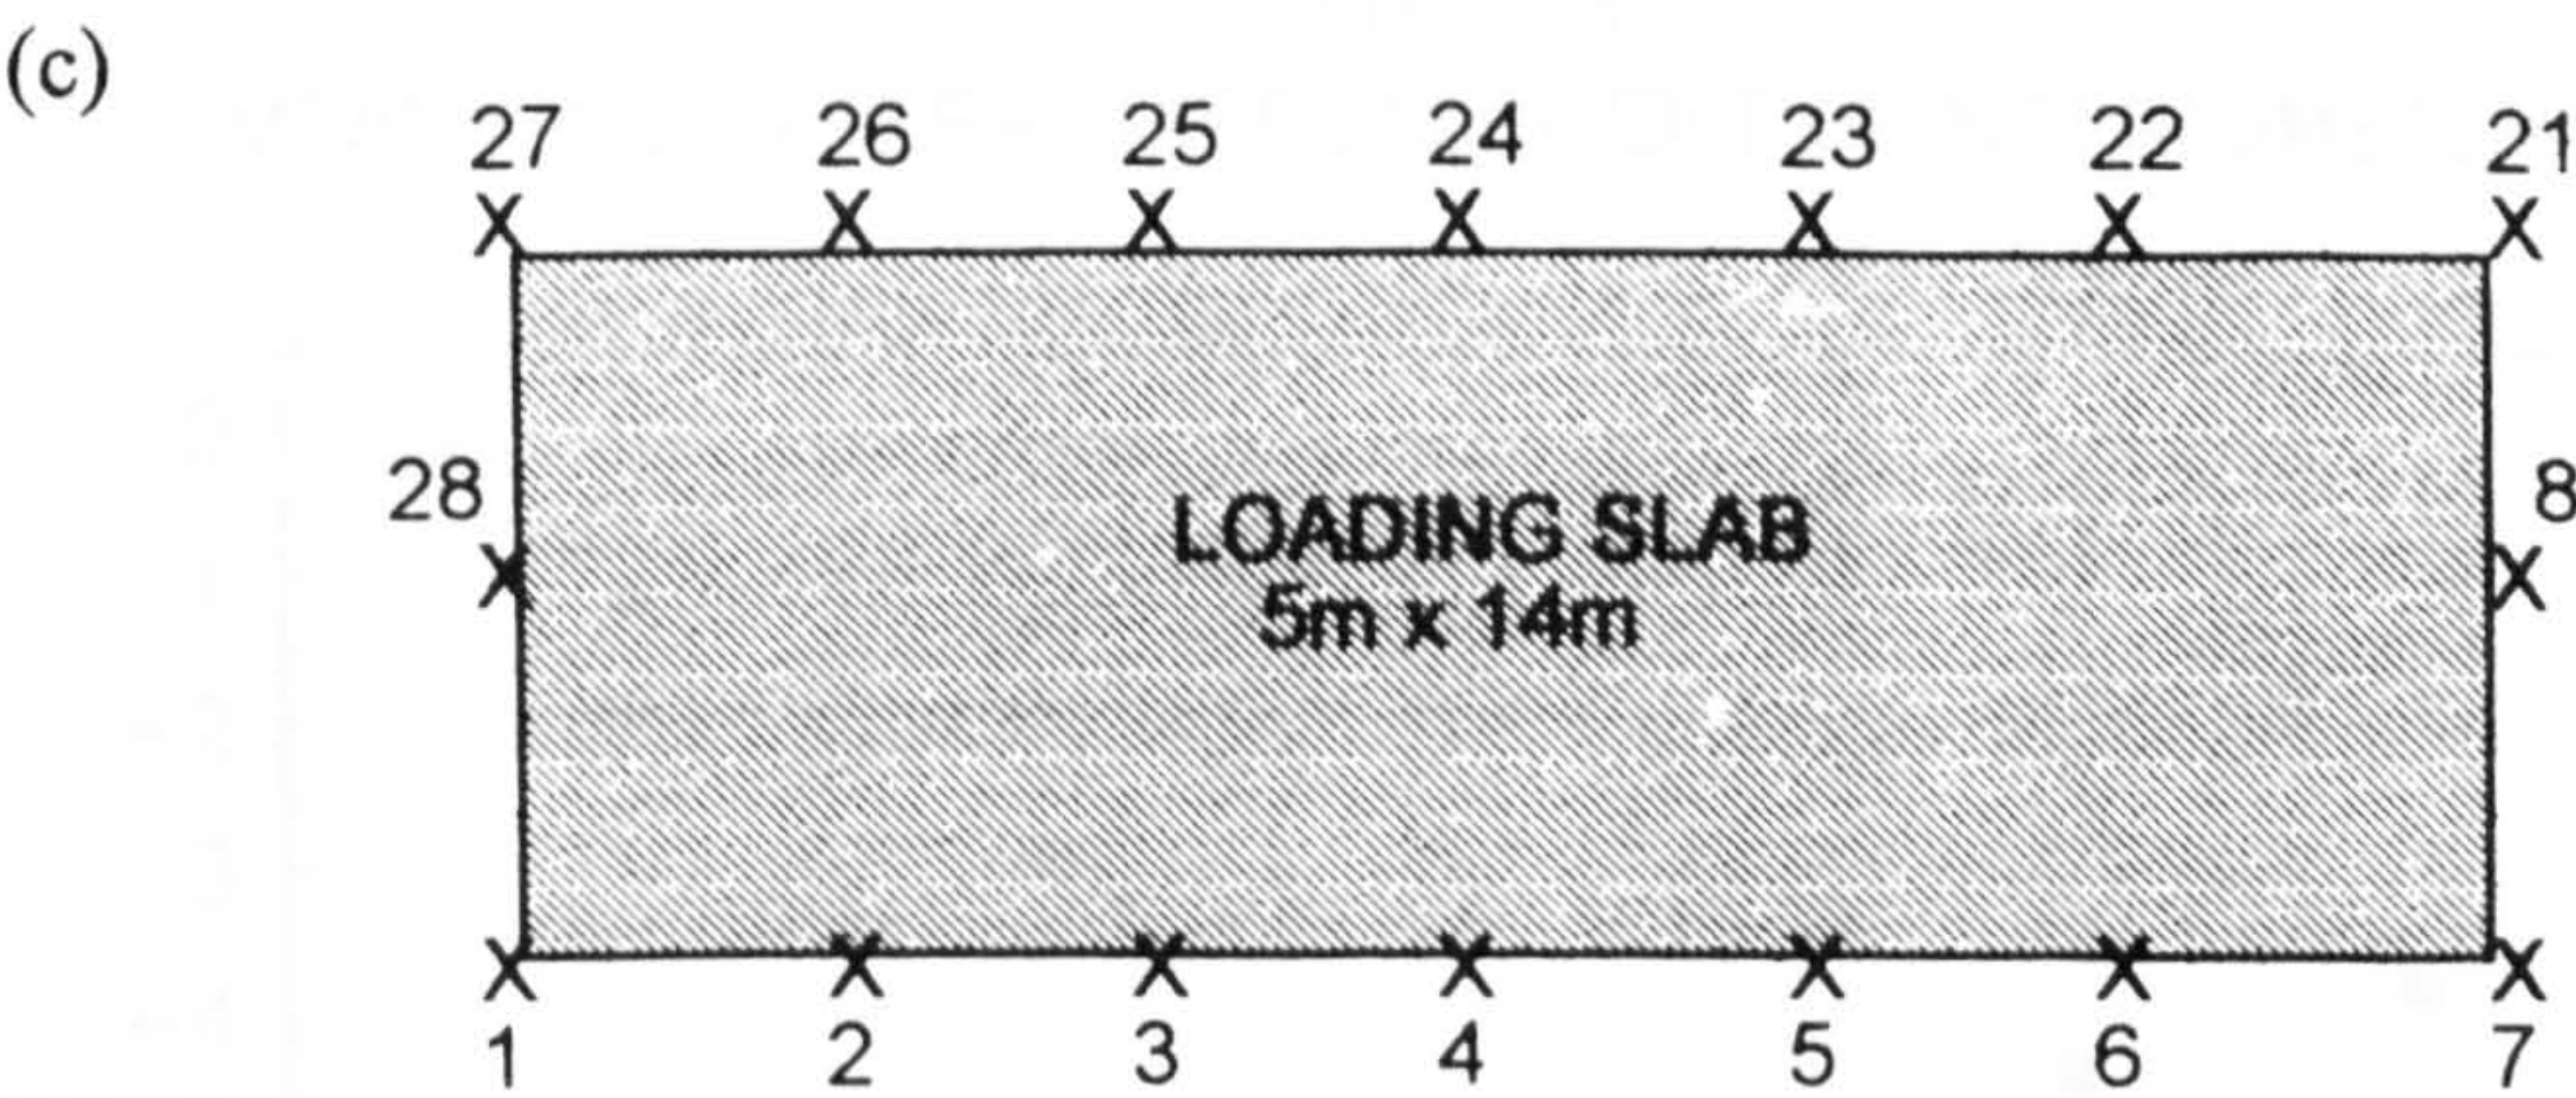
Typical loading sequence of concrete blocks on loading slab.
